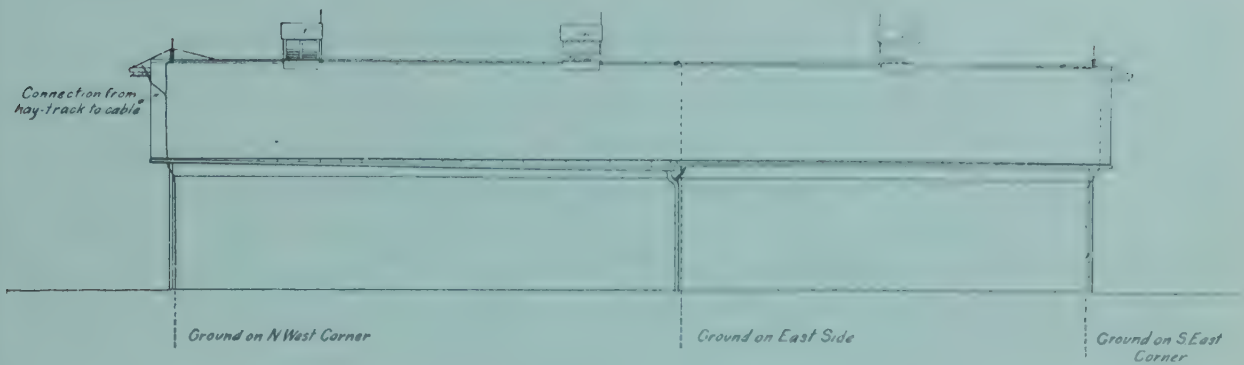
Outline Drawing of West Elevation of Grade Dairy and Beef Herds Barn.
